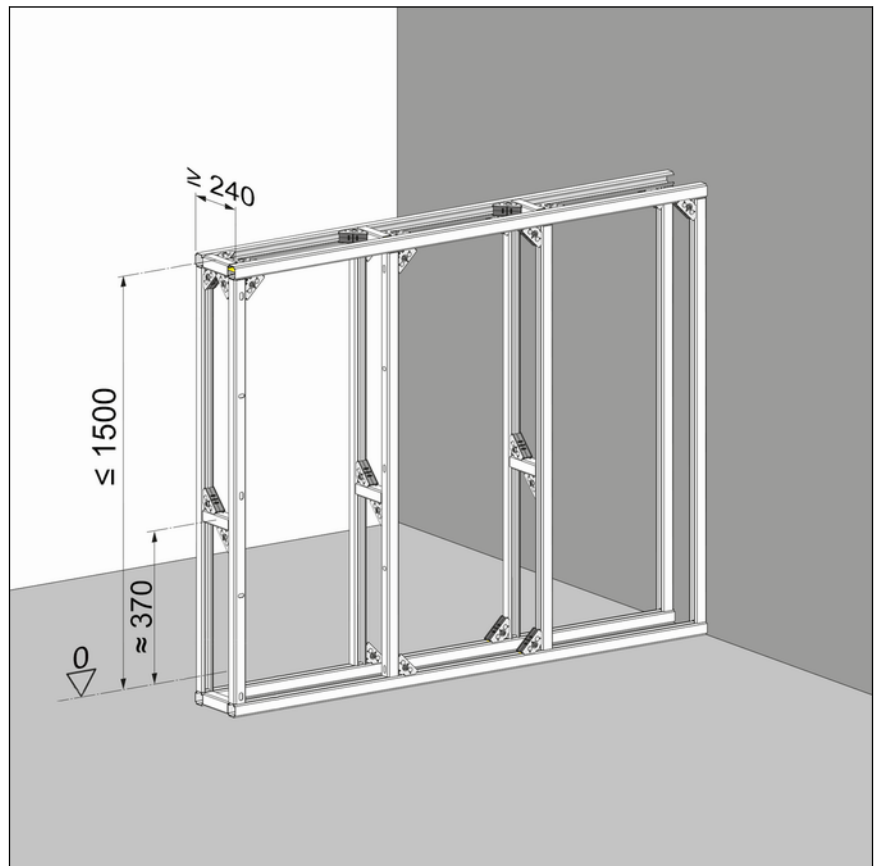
Installation dimensions half-height room partition (one-sided connected)
